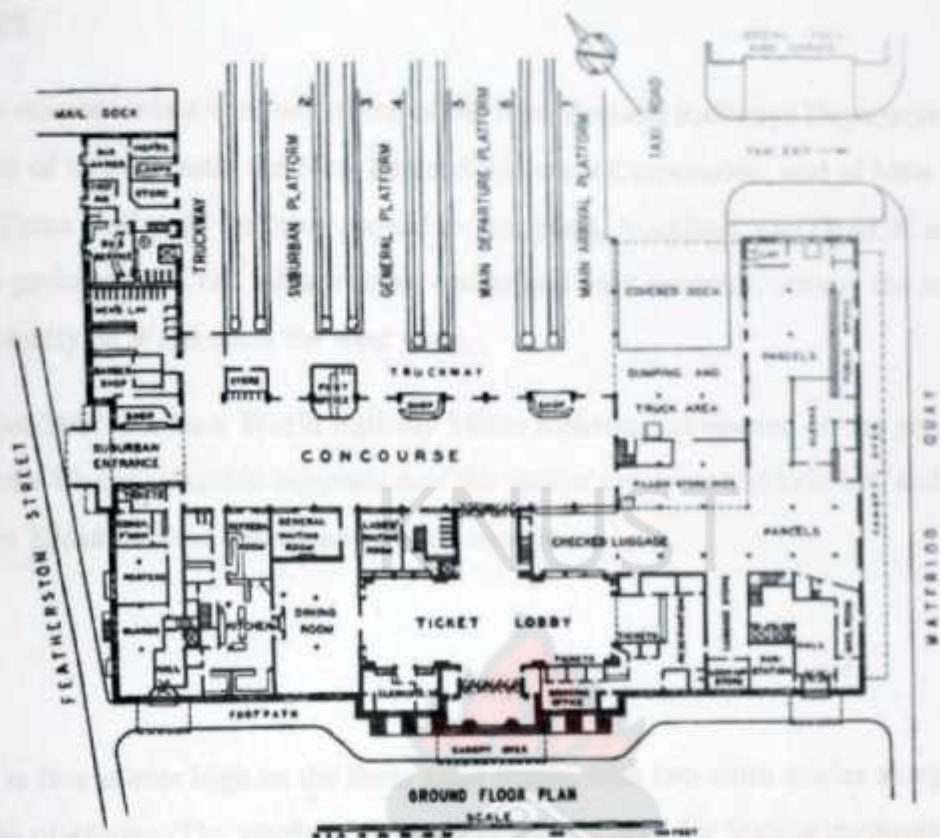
Layout showing the access to the new station and arrangement of the platforms
